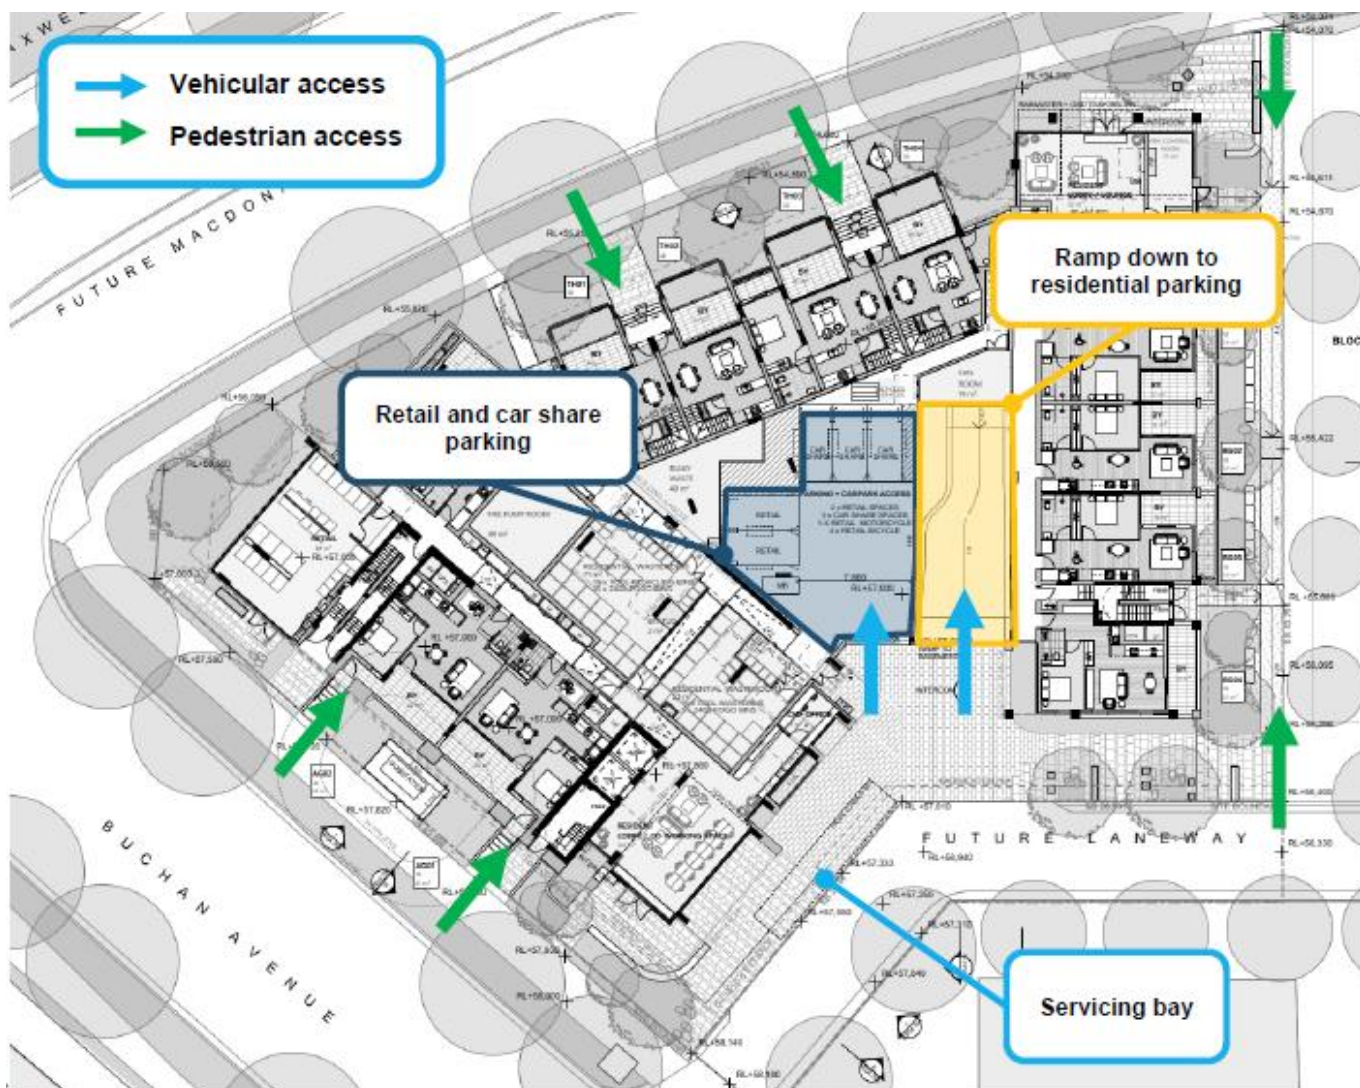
Proposed Site access arrangements (source: SCT, 2026)
